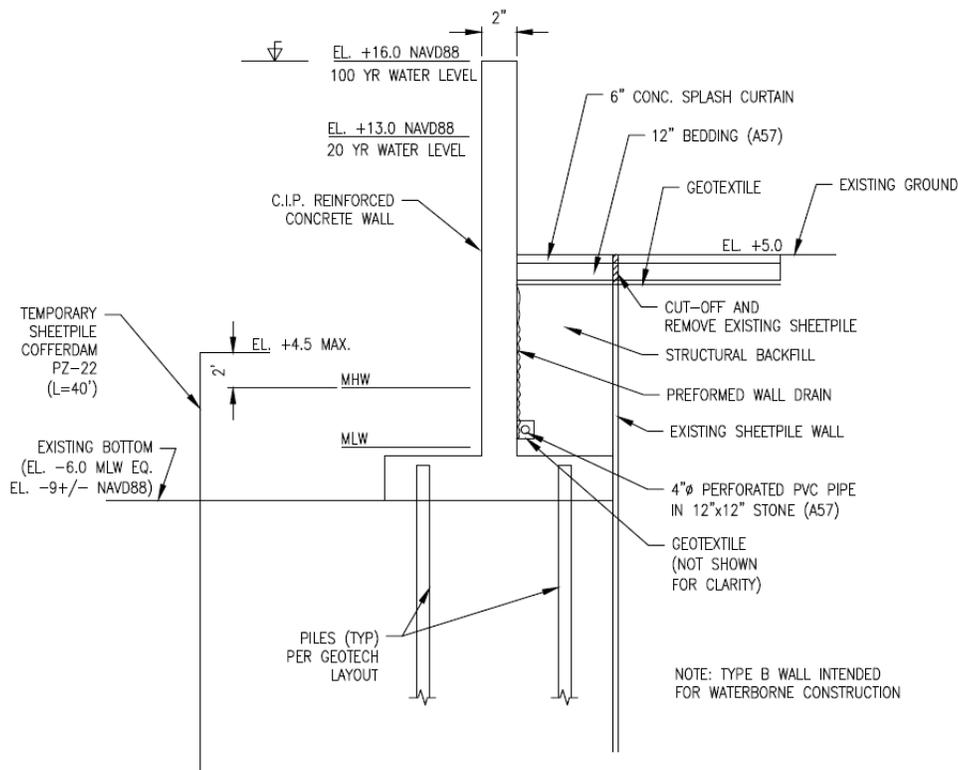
Typical Section – Concrete Cantilever Wall on Piles – Type B
